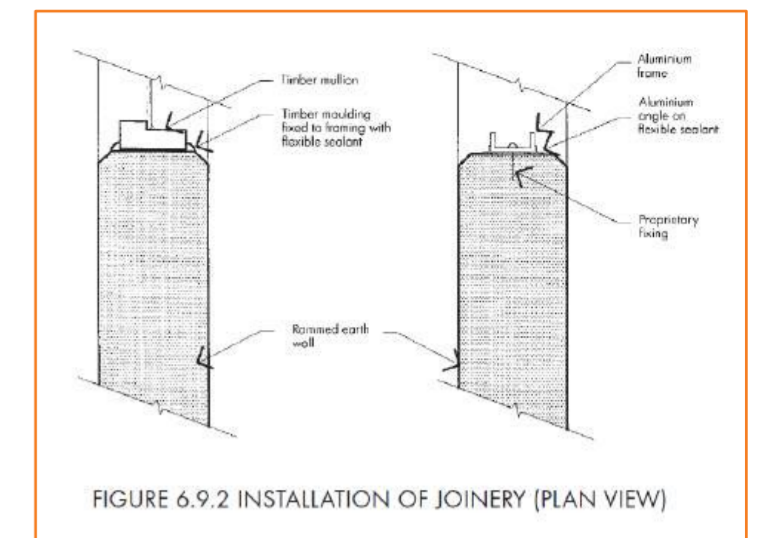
Typical window detailing. Extract from *Building with earth bricks and rammed earth in Australia
